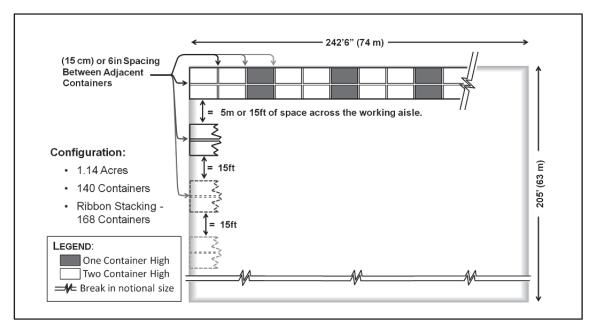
Cluster plan for side loader turret stacking of 40' containers (15' working aisles)
